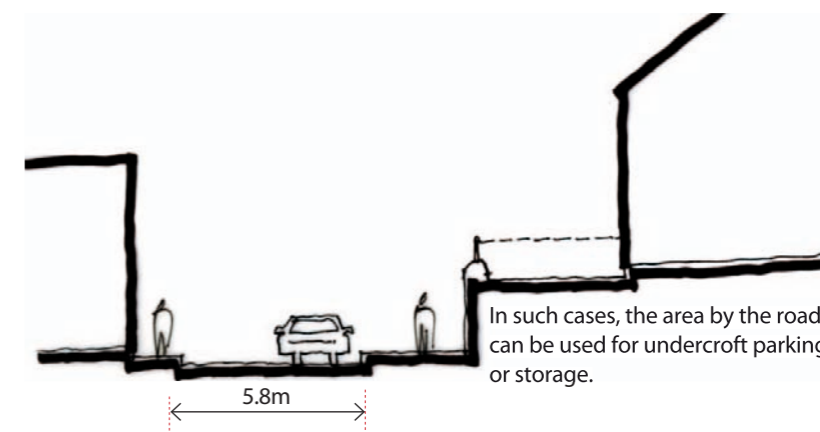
Indicative cross section through Abbey Street where the street slopes down from Daventry Town Centre. At parts, buildings remain at a higher level, and are supported by a retaining wall
